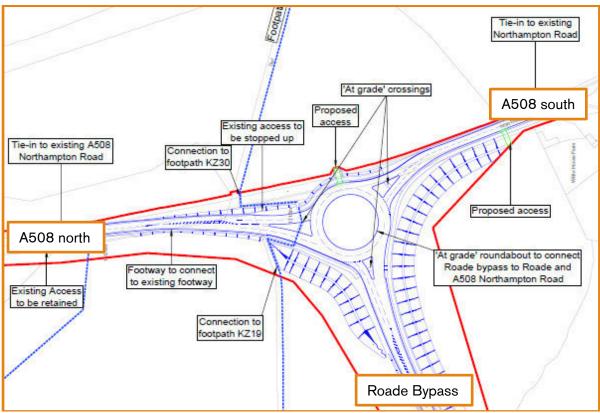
A508 Northampton Road/Roade Bypass 3-arm roundabout
